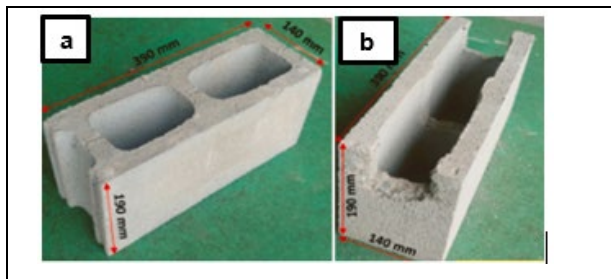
Prepared Masonry blocks: (a) hollow concrete block and (b) bond beam block
